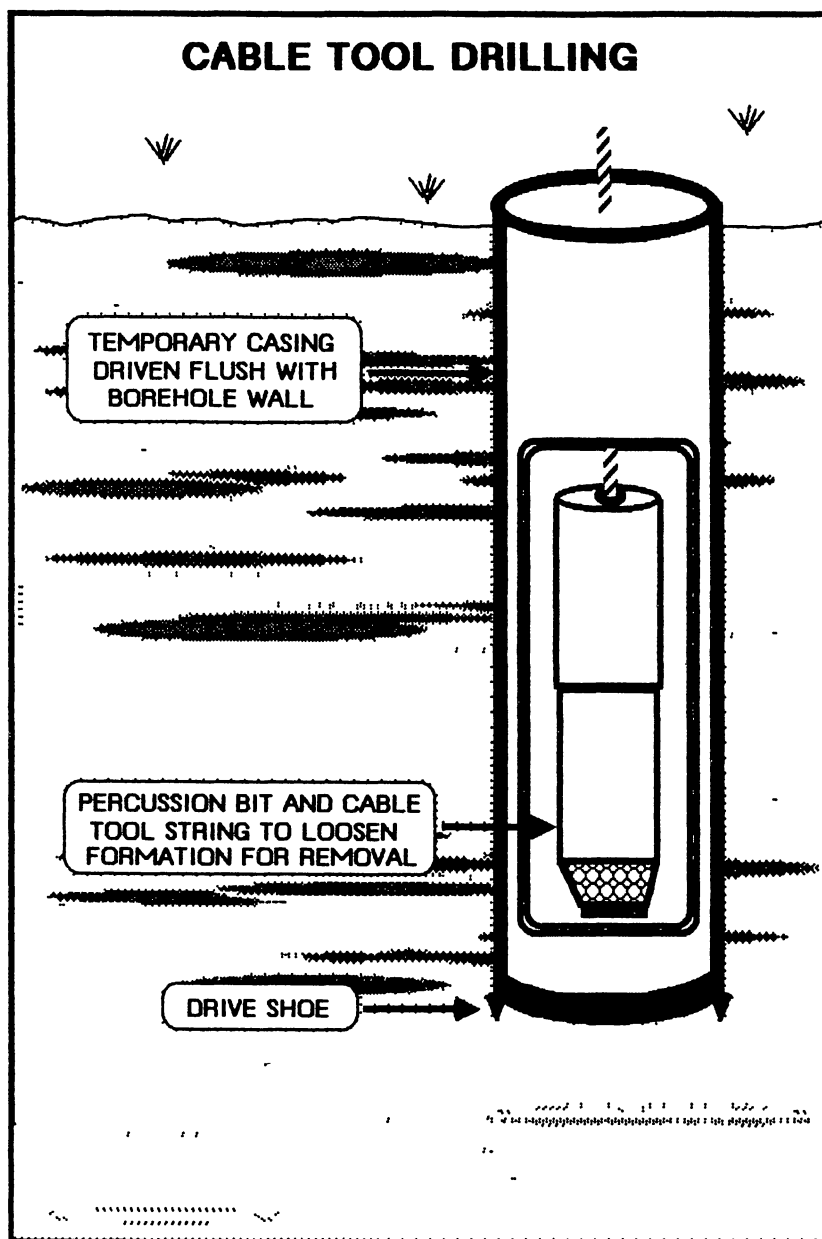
Cut-Away Sketch of Cable Tool Drilling Method
